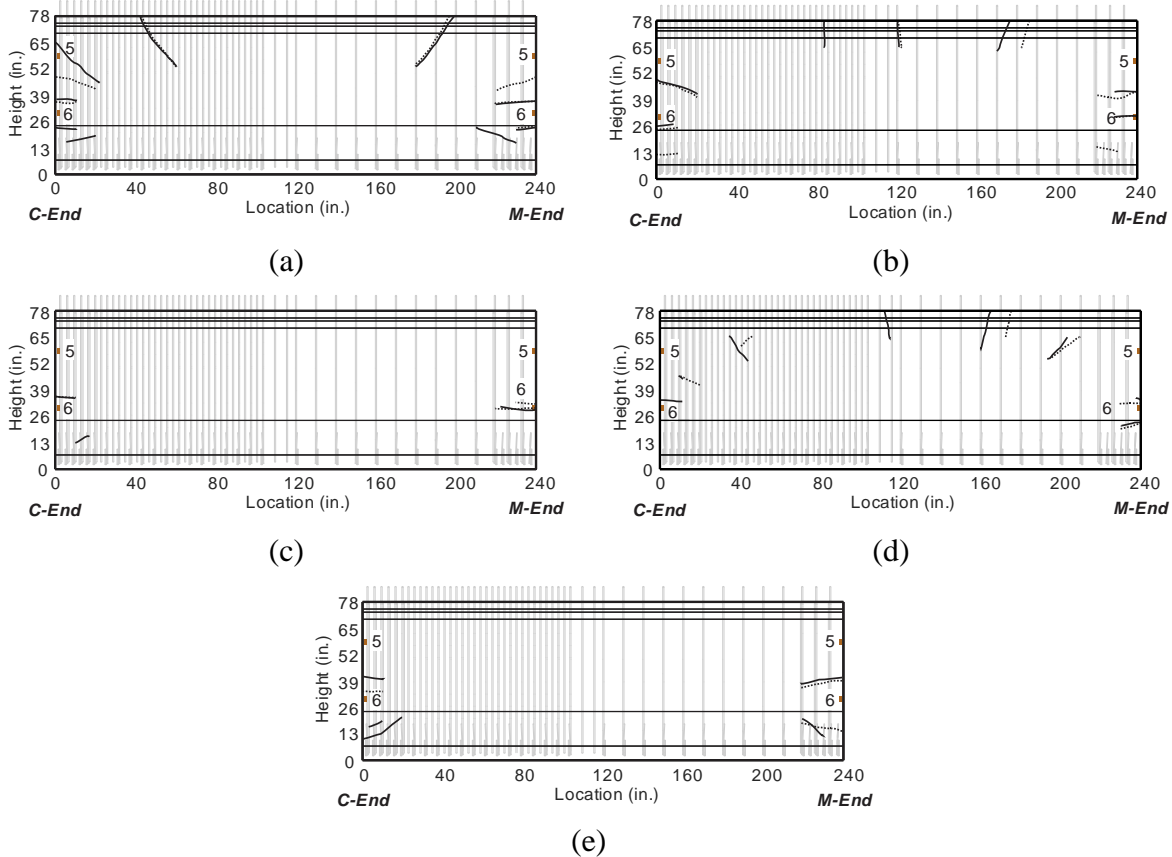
Cracking observed after prestressed transfer overlaid with external strain gage (XS-5 and XS-6) location shown on North face of specimen (Solid lines depict cracks visible on the North face and dashed lines depict cracks visible on the South face): (a) CT, (b) SH-30, (c) SH-70, (d) CR-70 and (e) PP-50
